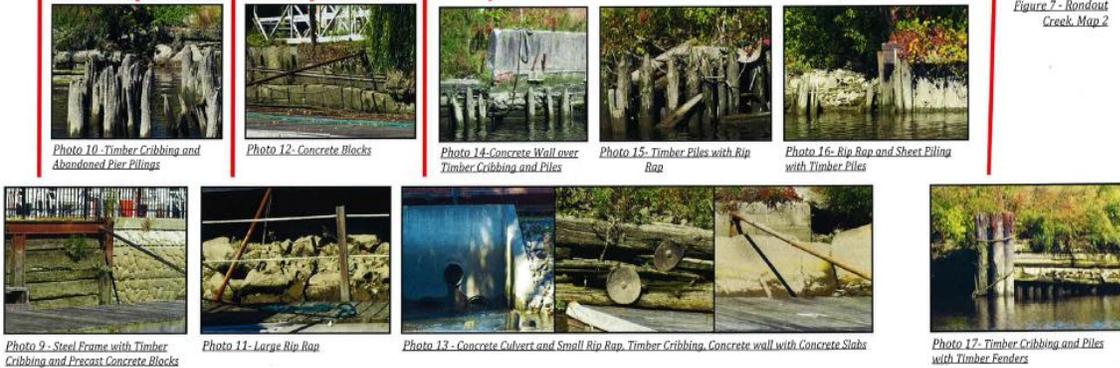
Timber Cribbing and Abandoned Pier Piling
